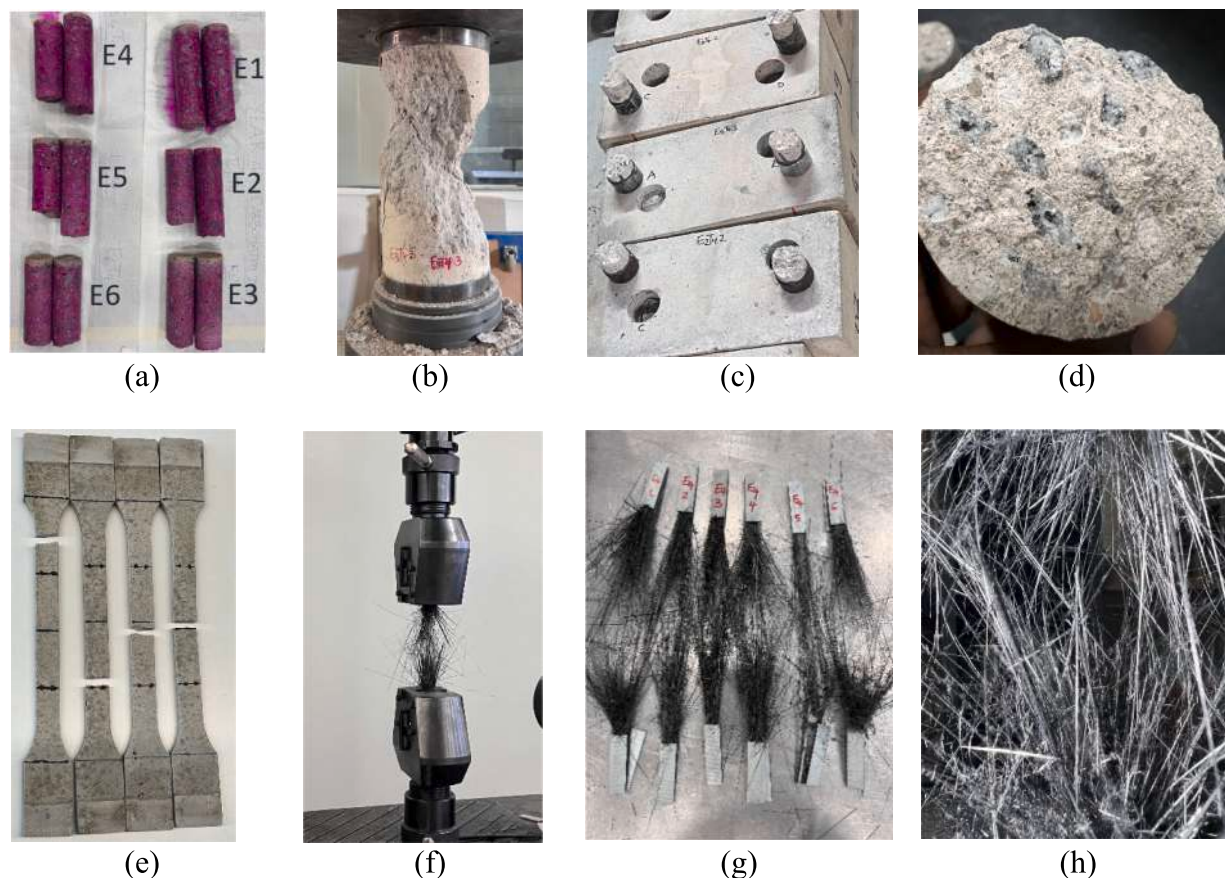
(a) Carbonation of concrete; typical failure modes from: (b) concrete under compression; (c,d) concrete under tension (pull-off tests); (e) epoxy adhesive under tension; and, (f to h) CFRP laminate under tension.
